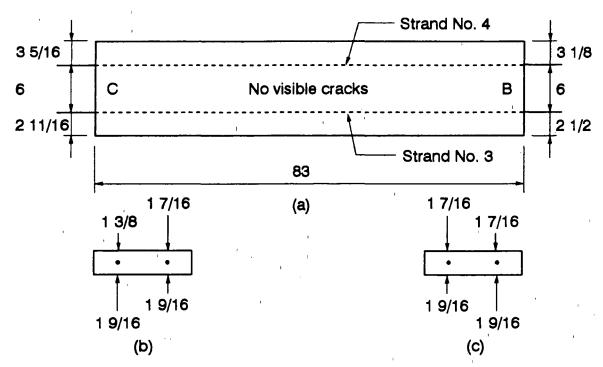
Specimen No. 2-3.0TC-5 (dimensions shown in inches):
